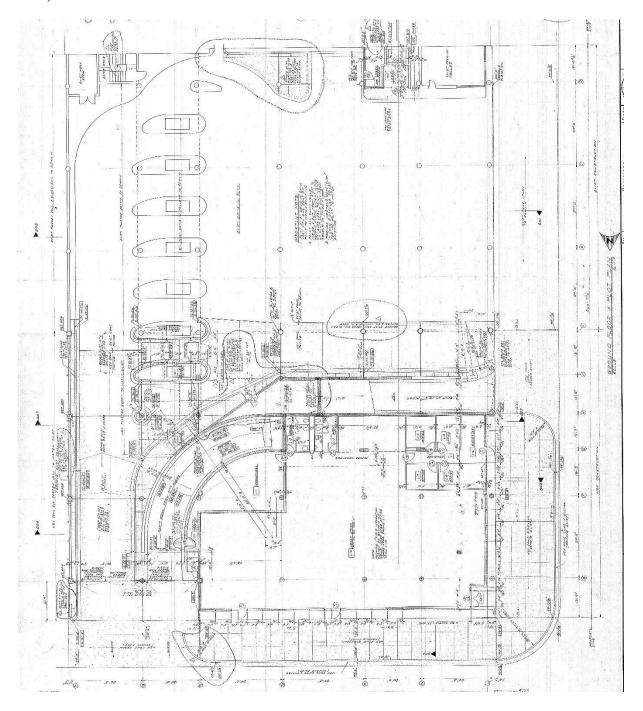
First Wichita National Bank Parking Garage/Motor Bank Second Floor Plan (Wood and Sibeck, Architects 1965).
